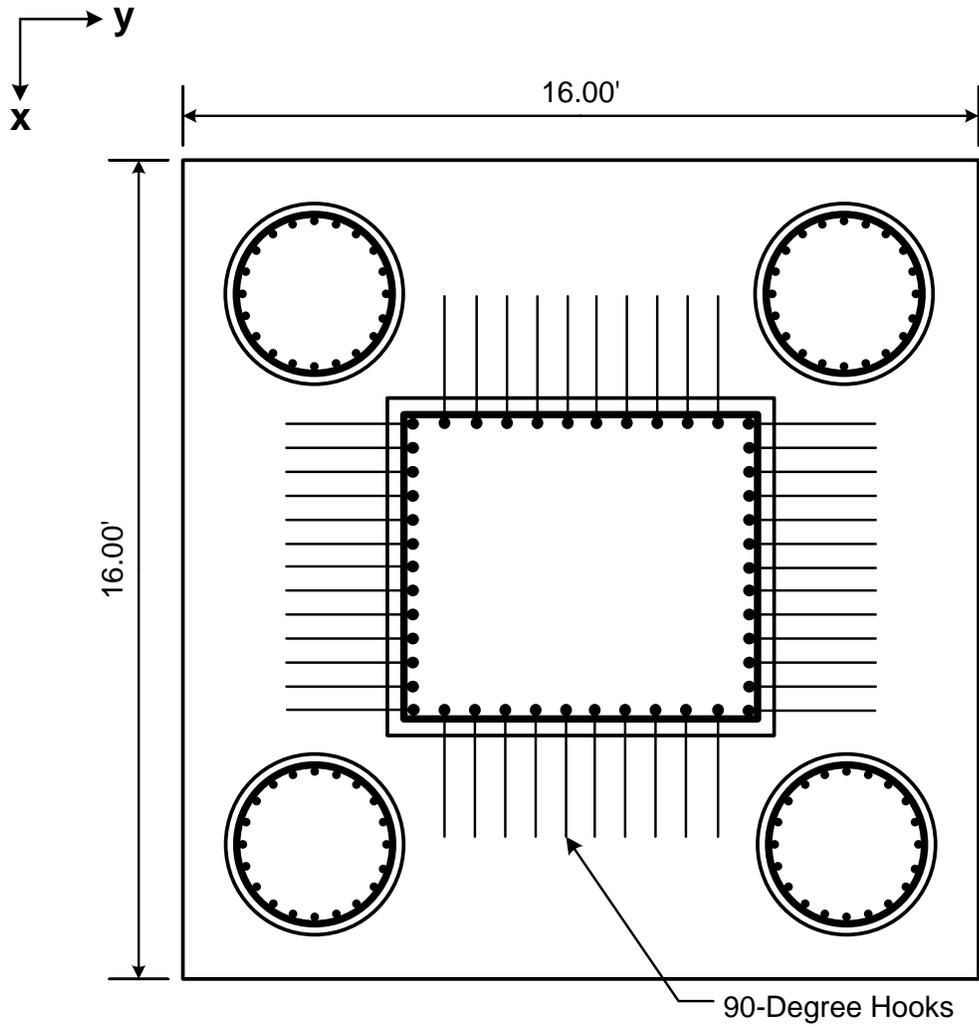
Reinforcement Details 1 - Anchorage of Ties
